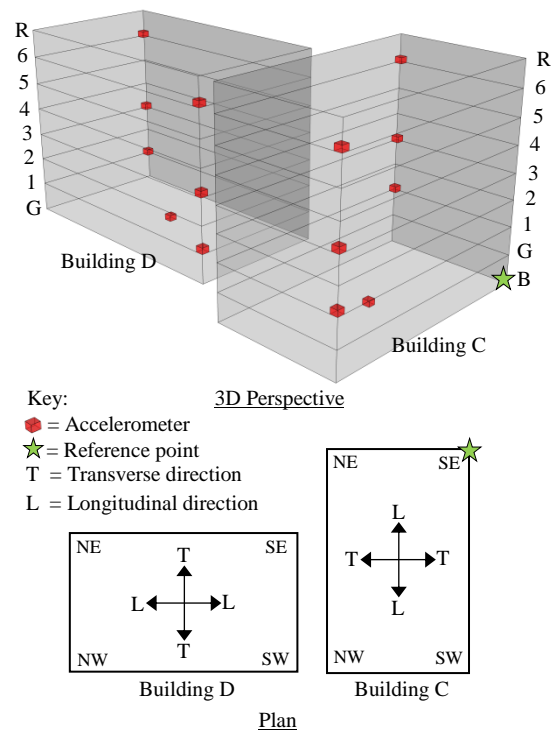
Layout and distribution of accelerometers in Buildings C and D.
